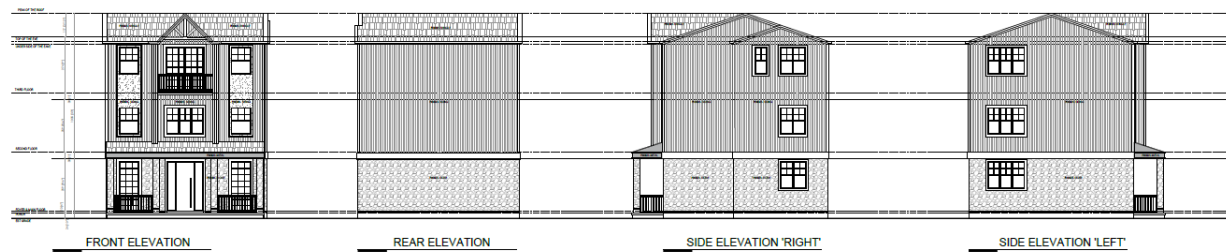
Proposed Elevations for the standalone Multiple-Dwelling along Leslie Street
